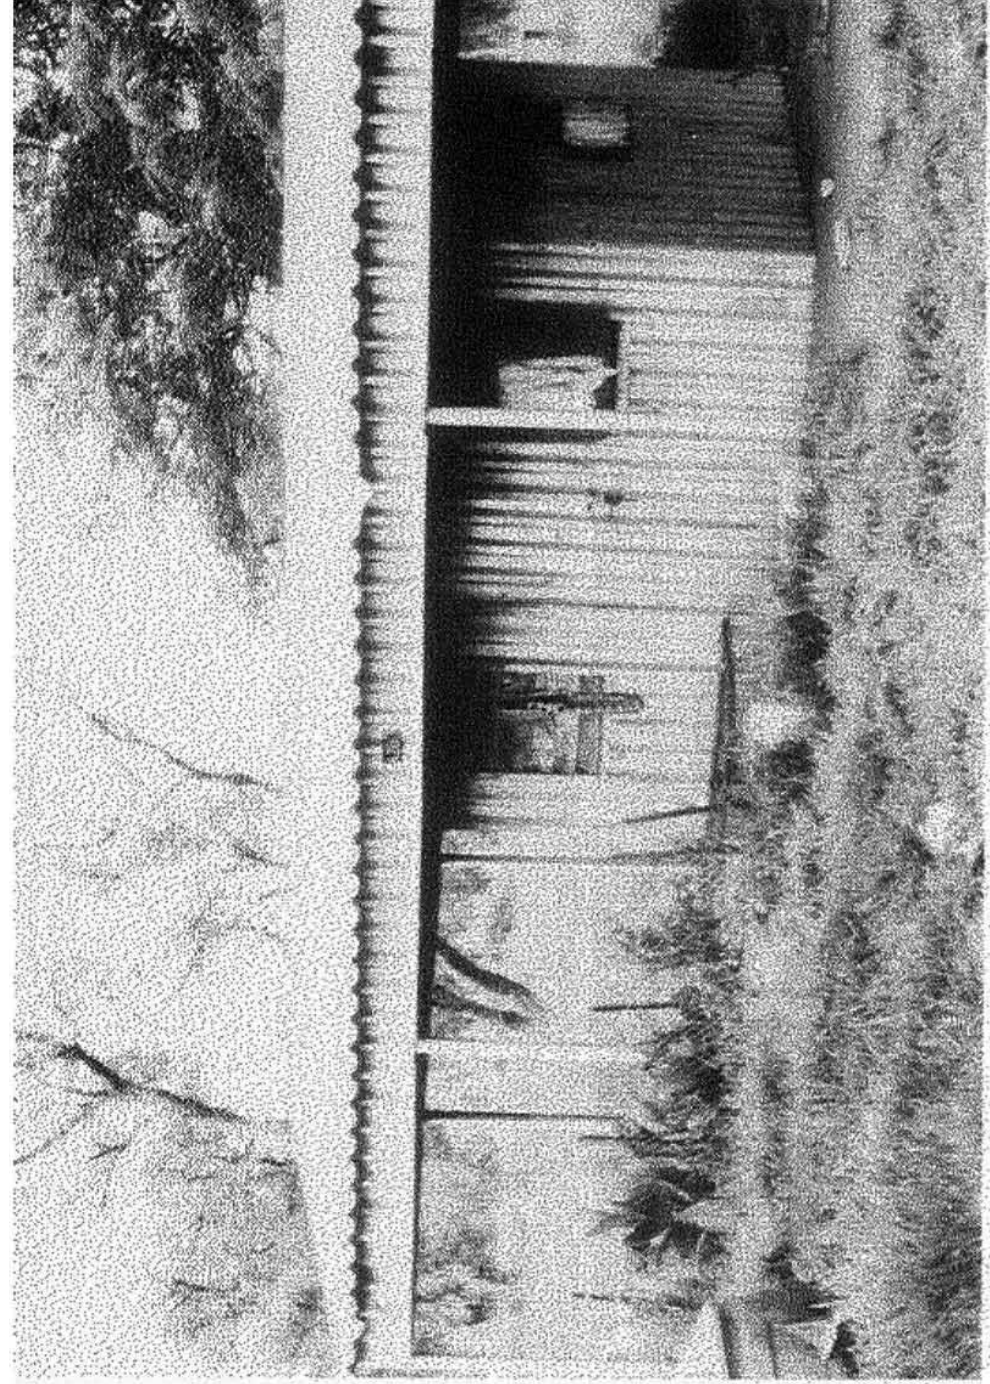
Occupied Kingstrand aluminium house, Bamyili, Northern Territory, April 1975.
